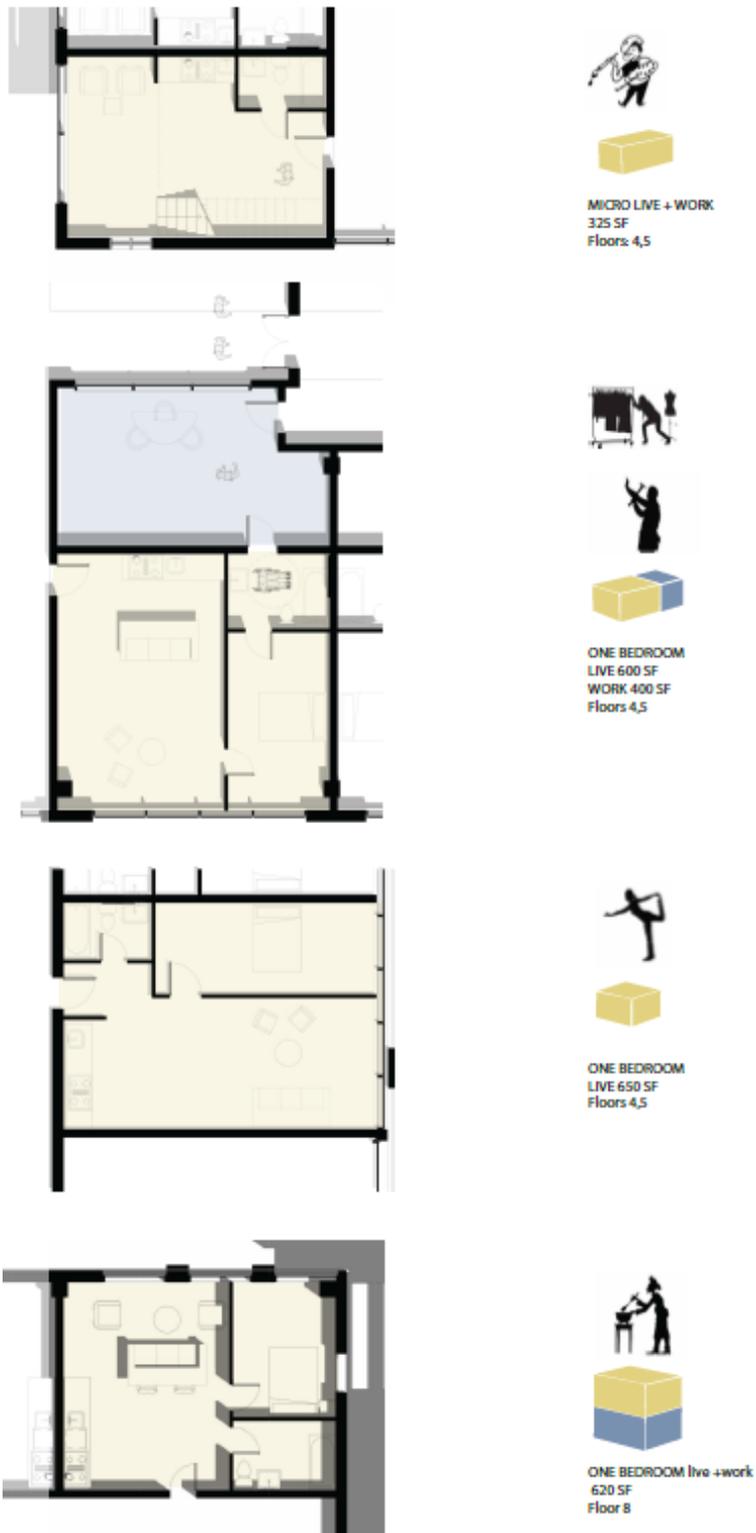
Variety of Apartment units, Floor Plans Part-1-2
